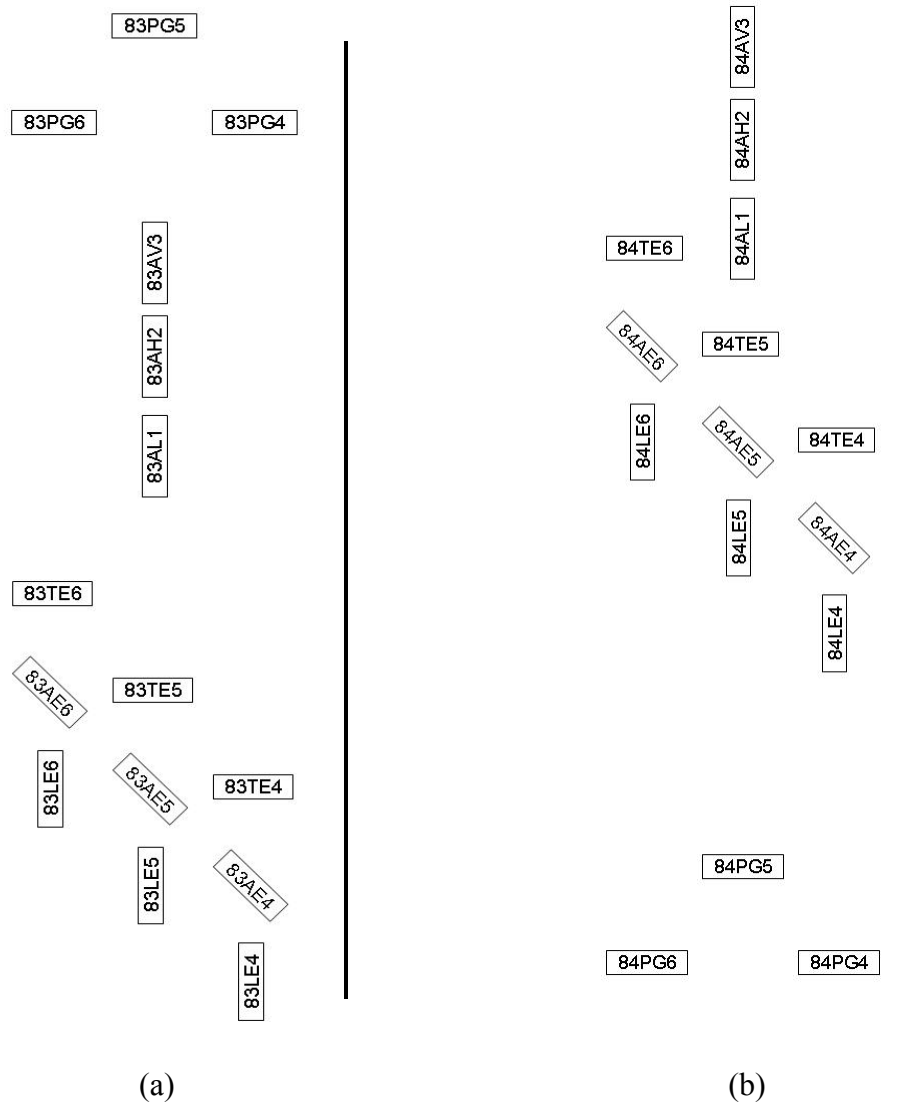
Flexible pavement sections sensor designations for westbound lanes of (a) cell 83 (b) cell 84
